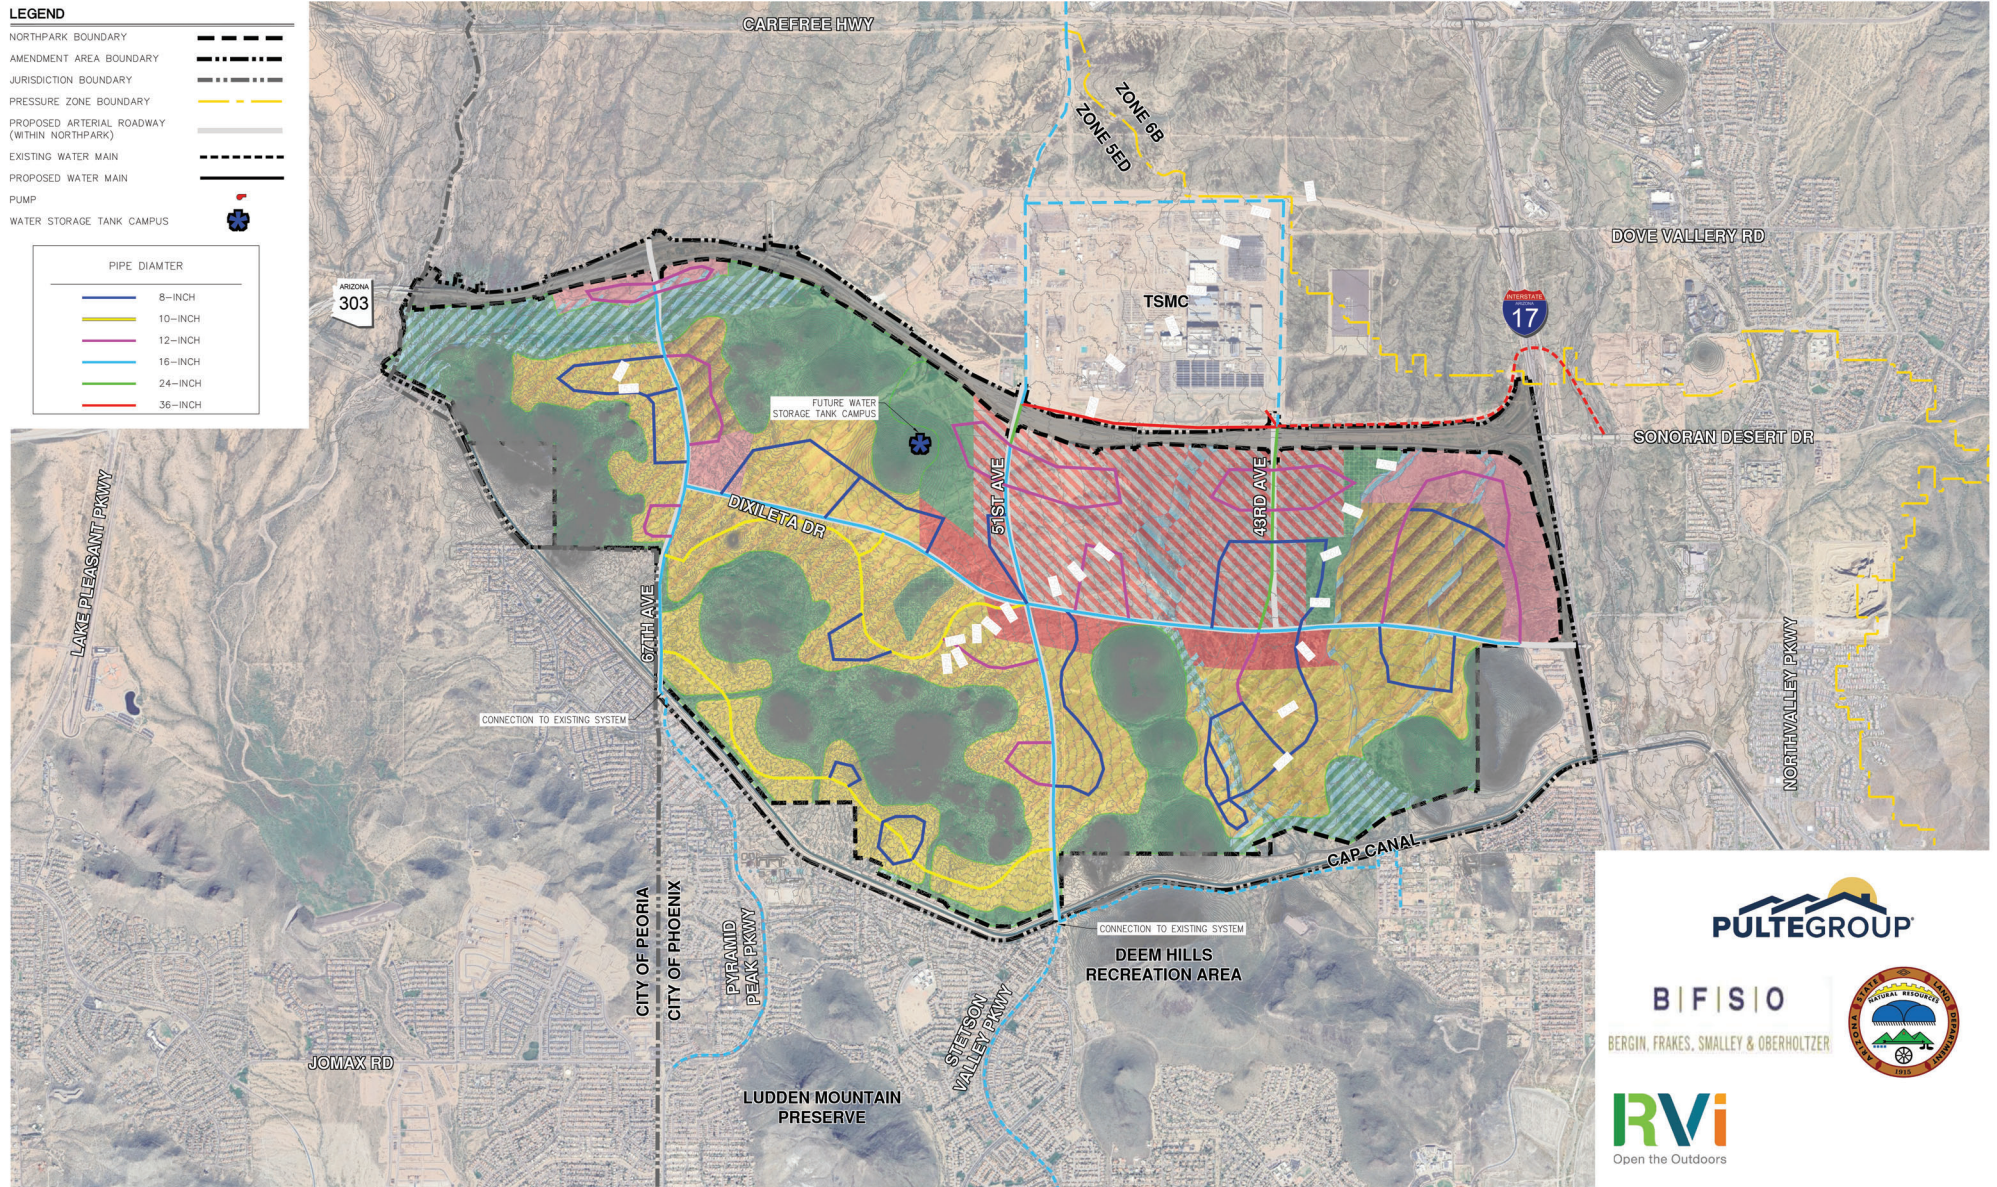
CONCEPTUAL MASTER WATER PLAN
